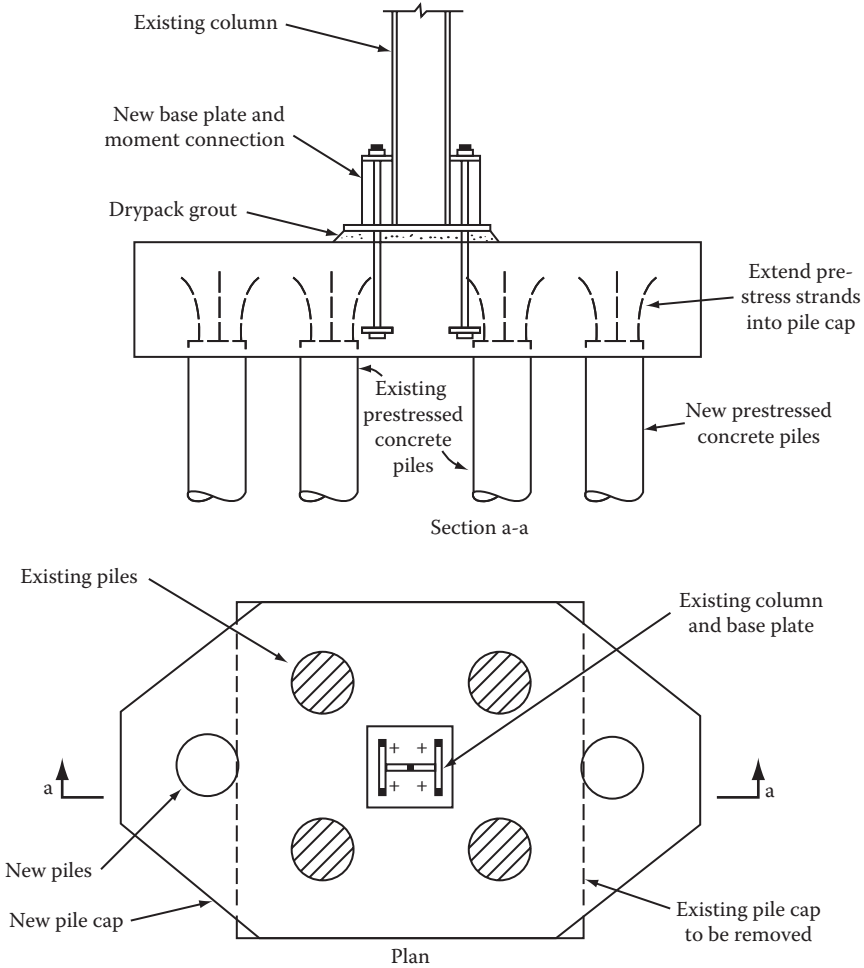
Upgrading of an existing pile foundation. Add additional piles or piers, remove, replace, or enlarge existing pile caps. *Note:* Existing framing to be temporarily shored to permit removal of existing pile cap and column base plate. Drive new piles; weld new base plate and moment connection to column; pour new pile cap; and dry pack under base plate.
